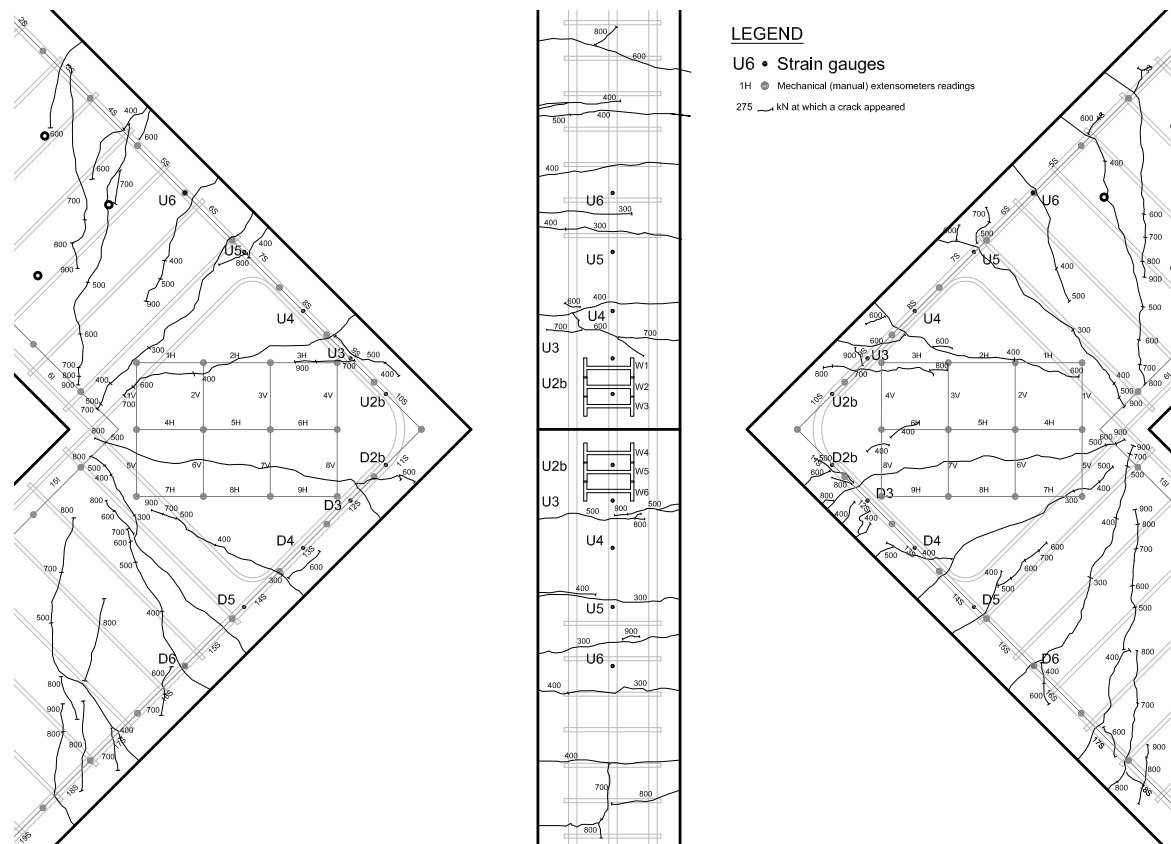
45-CV-25. Crack pattern. From left to right: front view (A), side view, front view (B)
